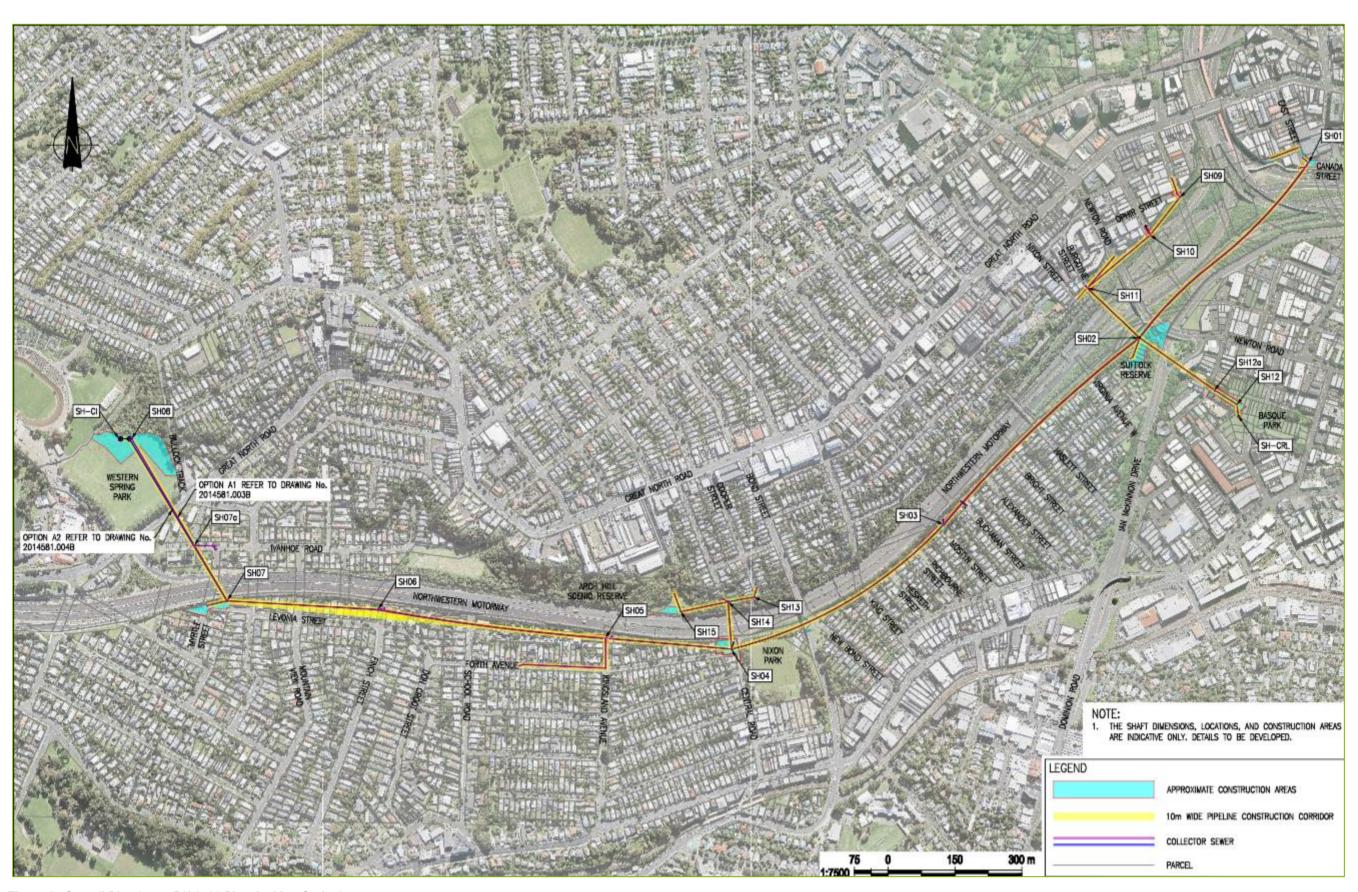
Overall Plan (up to DN 2400 Pipe Jacking Option)
